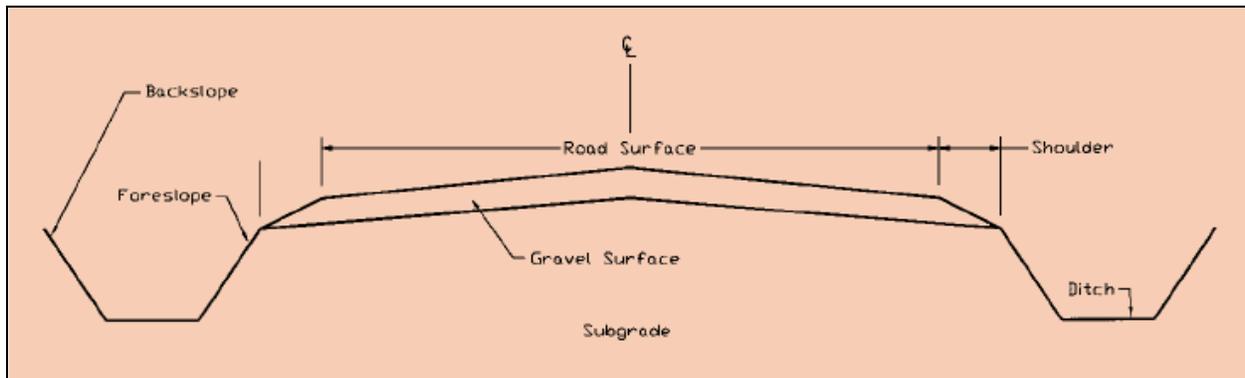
Road cross section (from *Gravel Roads and Maintenance and Design, SD LTAP Nov. 2000*)
